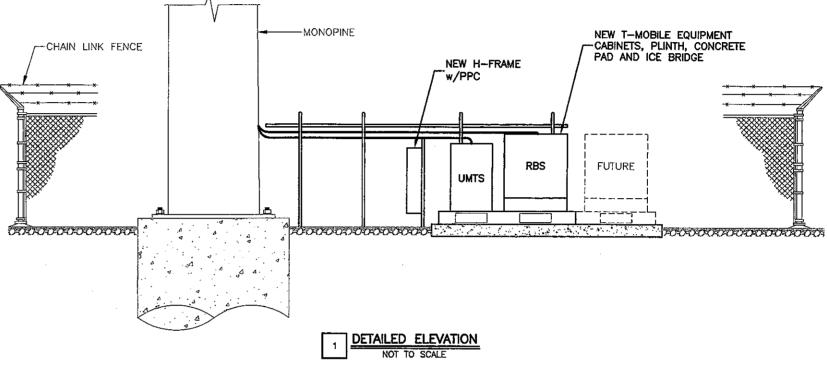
DETAIL SCHEMATIC IN NATURE ONLY, NOT ALL NEW EQUIPMENT SHOWN, REF. SITE PLAN(S) FOR EXACT ORIENTATION AND LOCATION OF NEW T-MOBILE EQUIPMENT.
